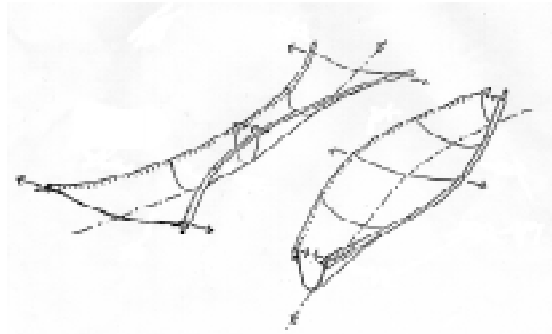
A simple flat rectangular sheet of fabric can be used to form variable section beams.
